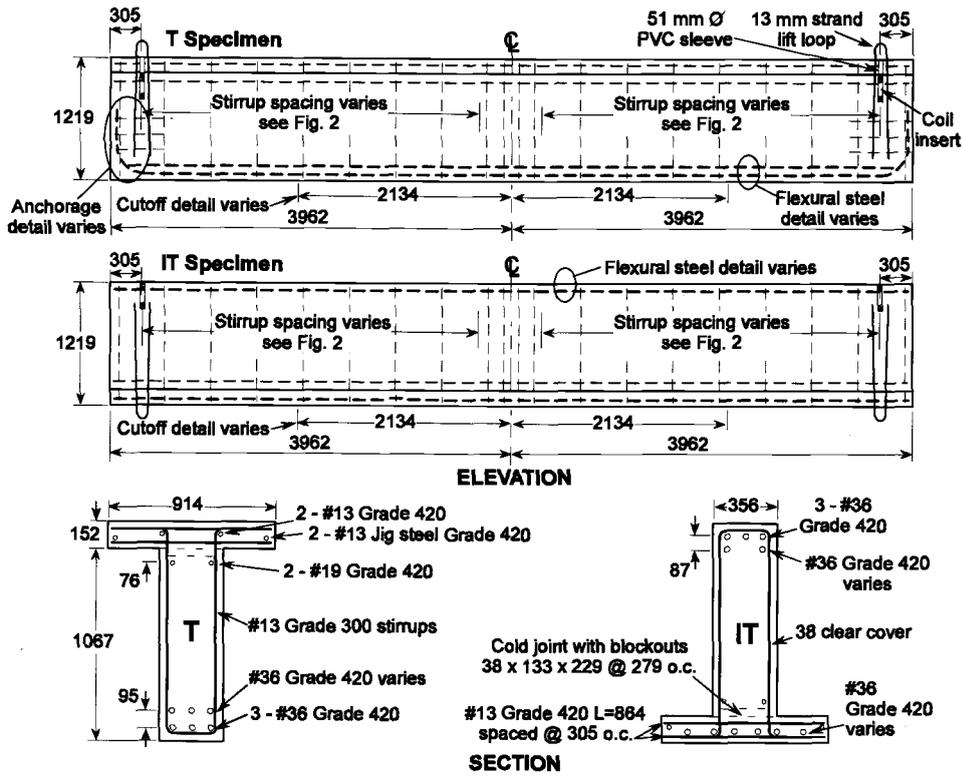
Typical full-scale LCF specimen (units = mm).
